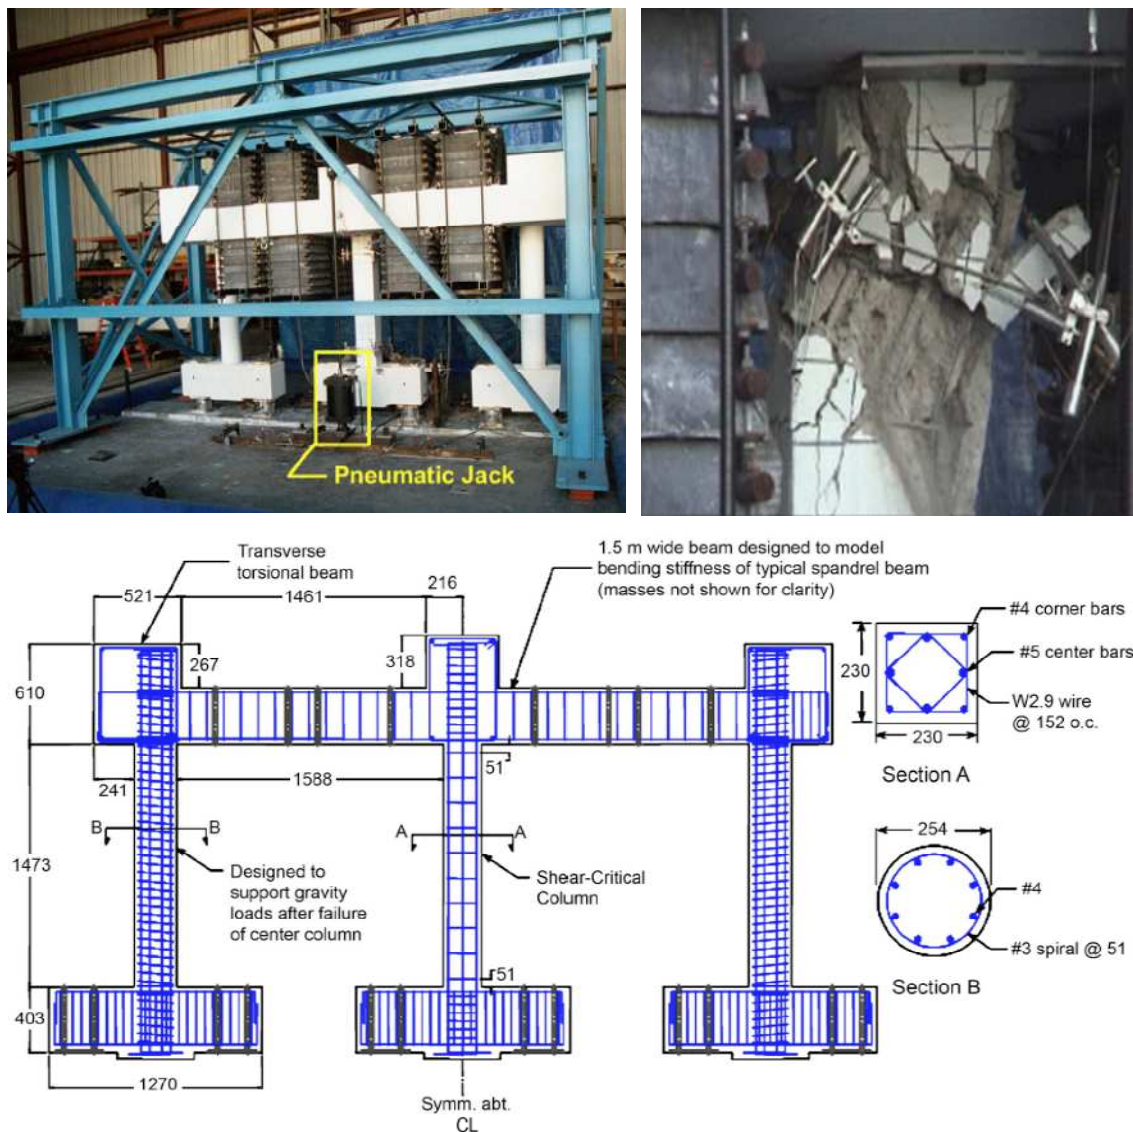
Second specimen on shaking table, damage to the top of the centre column of the second specimen at 29.8 sec, and the (Elwood and Moehle, 2008)
